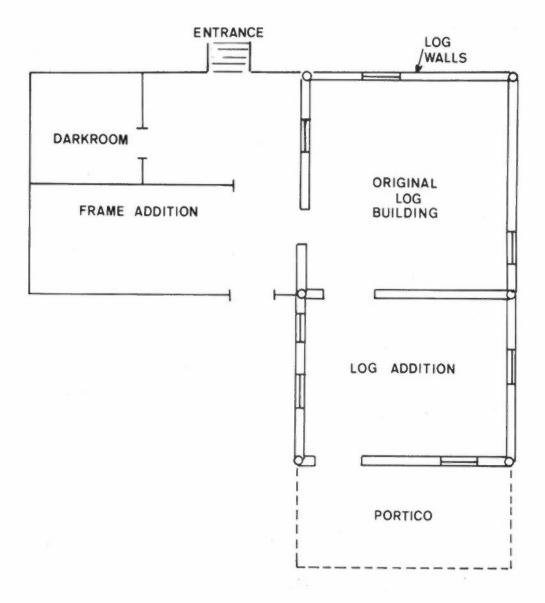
SUPERINTENDENT'S HOUSE - FLOOR PLAN
